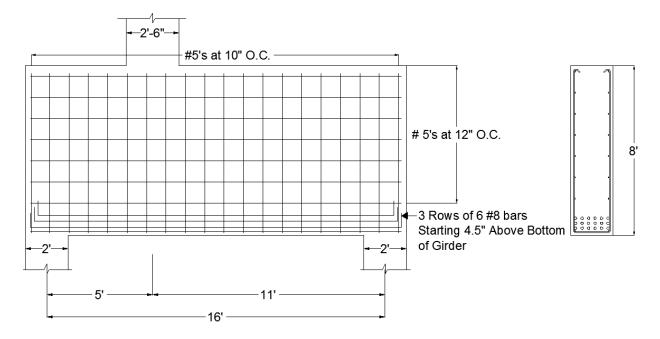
STM Design Example 2 - Final Design Cut Sections
